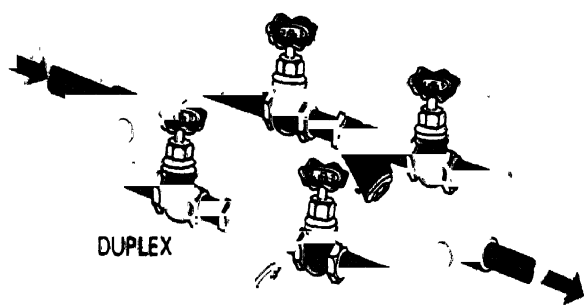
ARRANGEMENT OF STRAINERS IN A PIPE LINE
